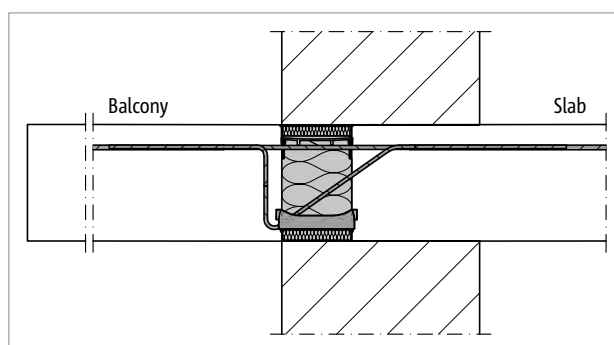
Schöck Isokorb® XT type K: Connection with single-leaf masonry
